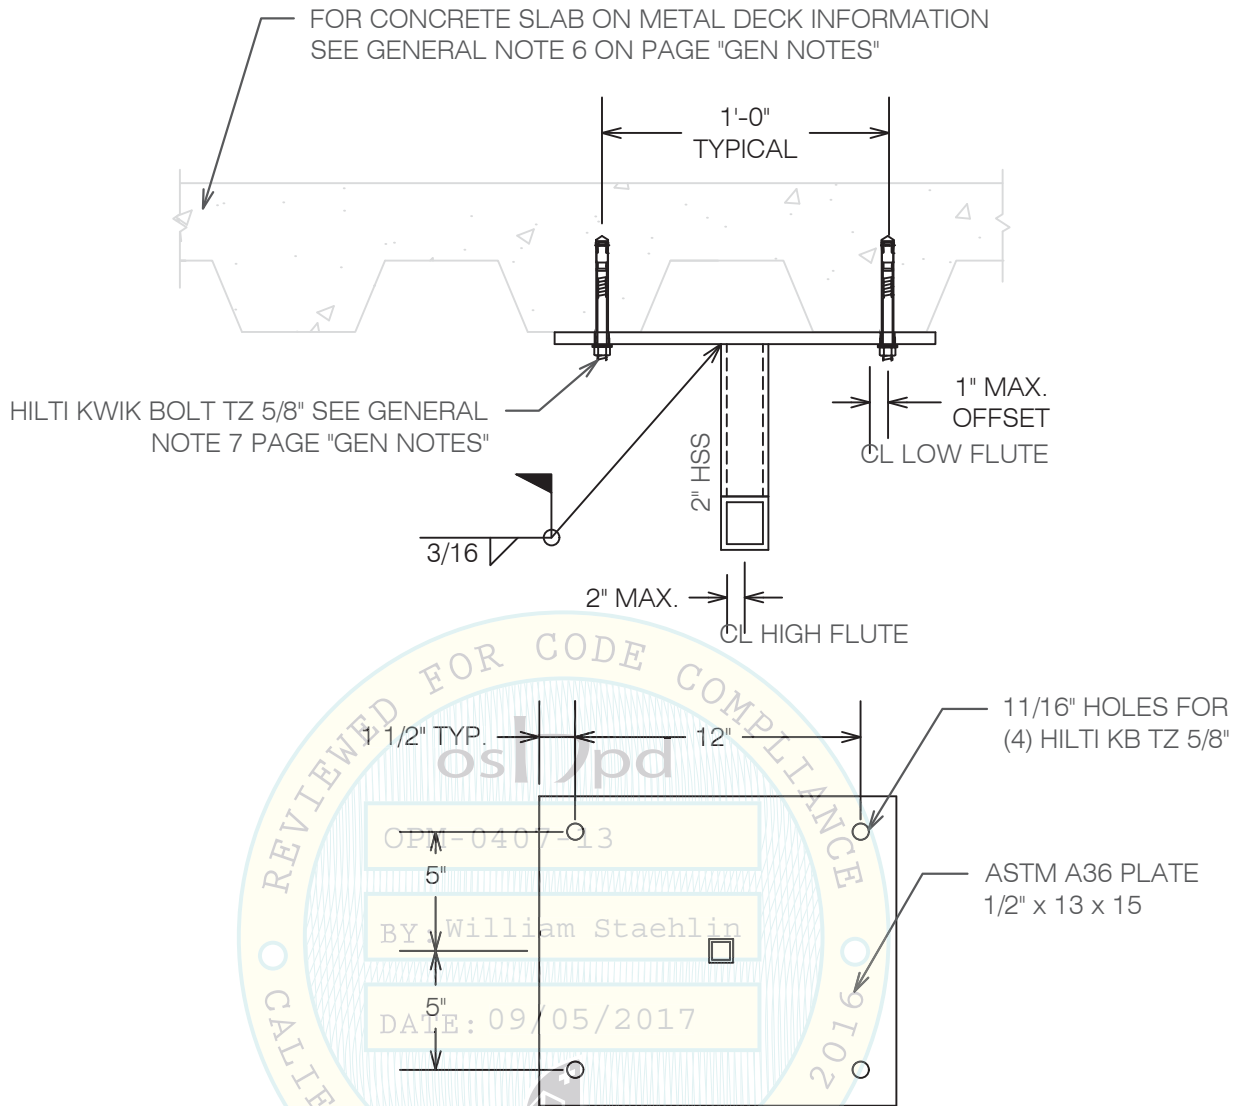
DETAIL A FOR CONNECTION OF ALL MODELS TO METAL DECK SLABS OR A SOLID CONCRETE SLAB
